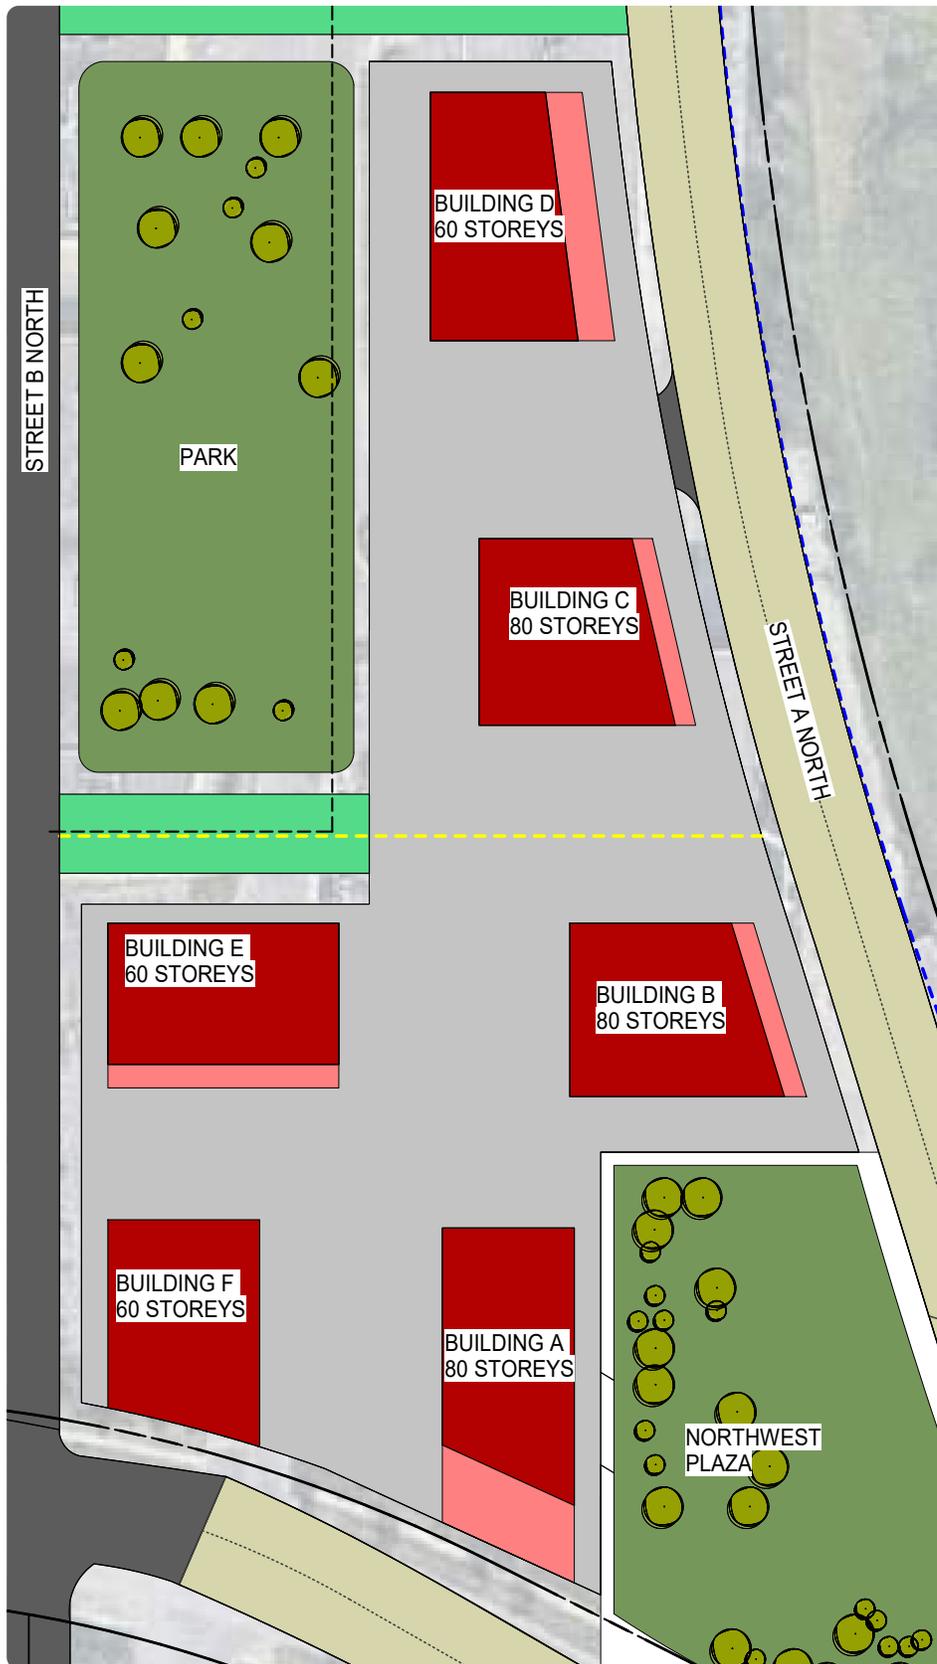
Site Plan (Prepared by BDP. Quadrangle Architects)
